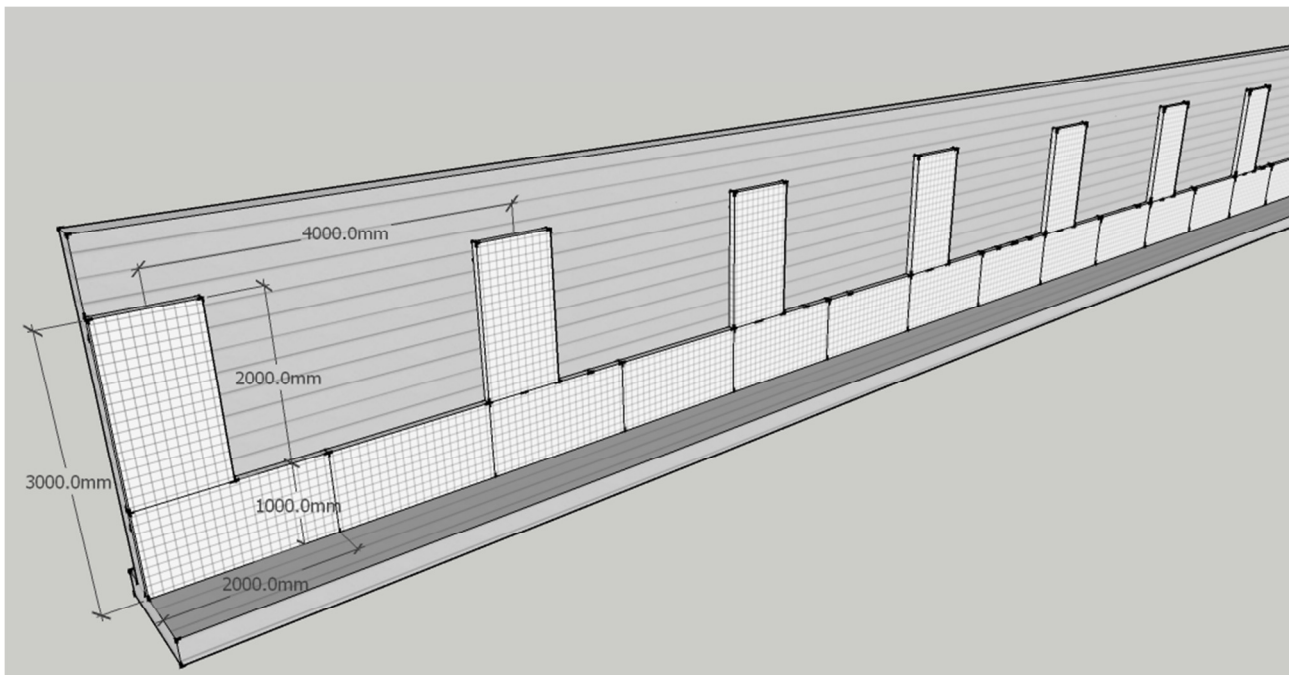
Arrangement of drainage pillars, wheelbase of 4 m
